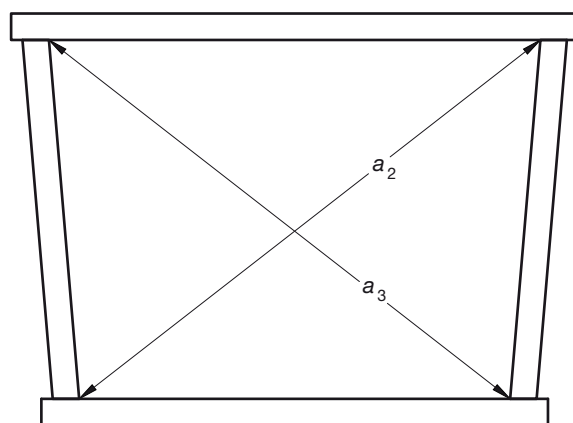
(3) TOLERANCE ON SHAPE OF A BOX SECTION
